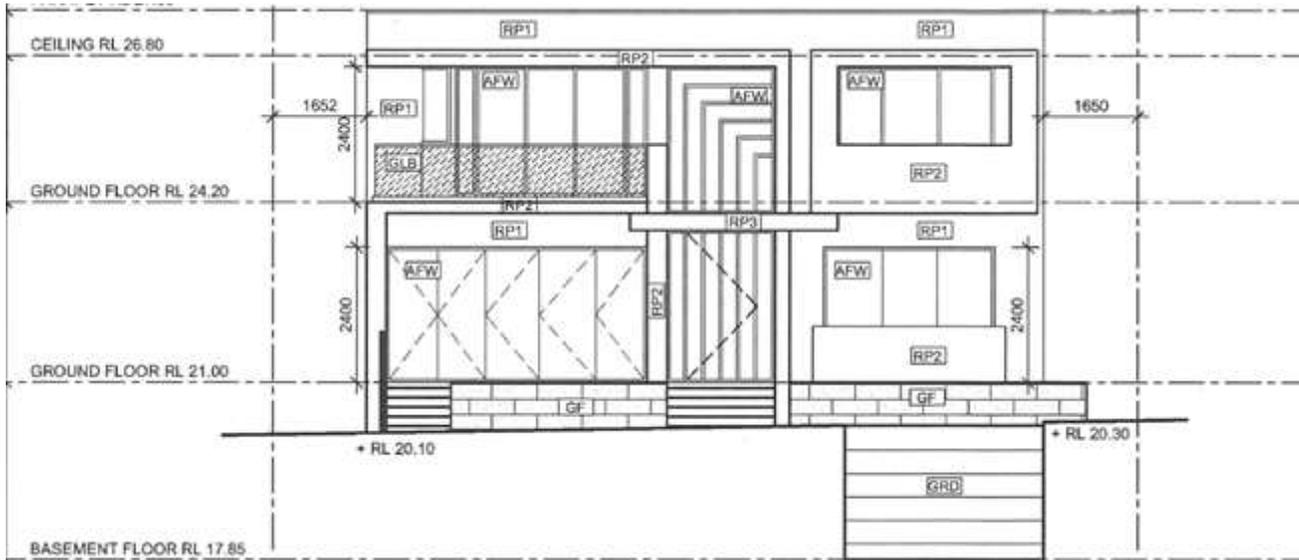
An extract of the proposed front elevation (north) of the dwelling.
